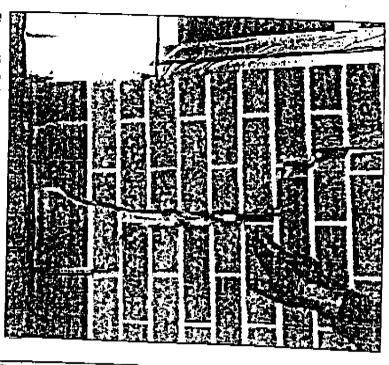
Split bricks and damaged window framing (on left). (From Jochim, 1987.)
